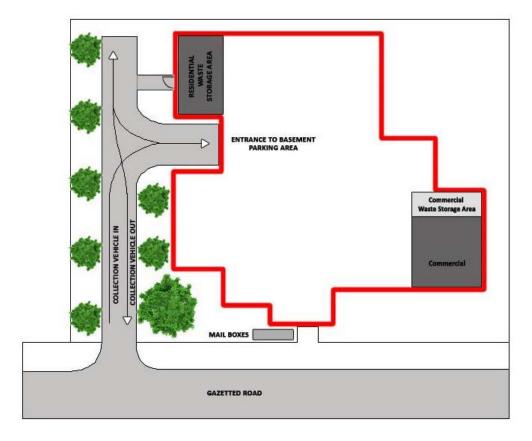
Example of an acceptable on-site (off-street) Waste Storage Area
